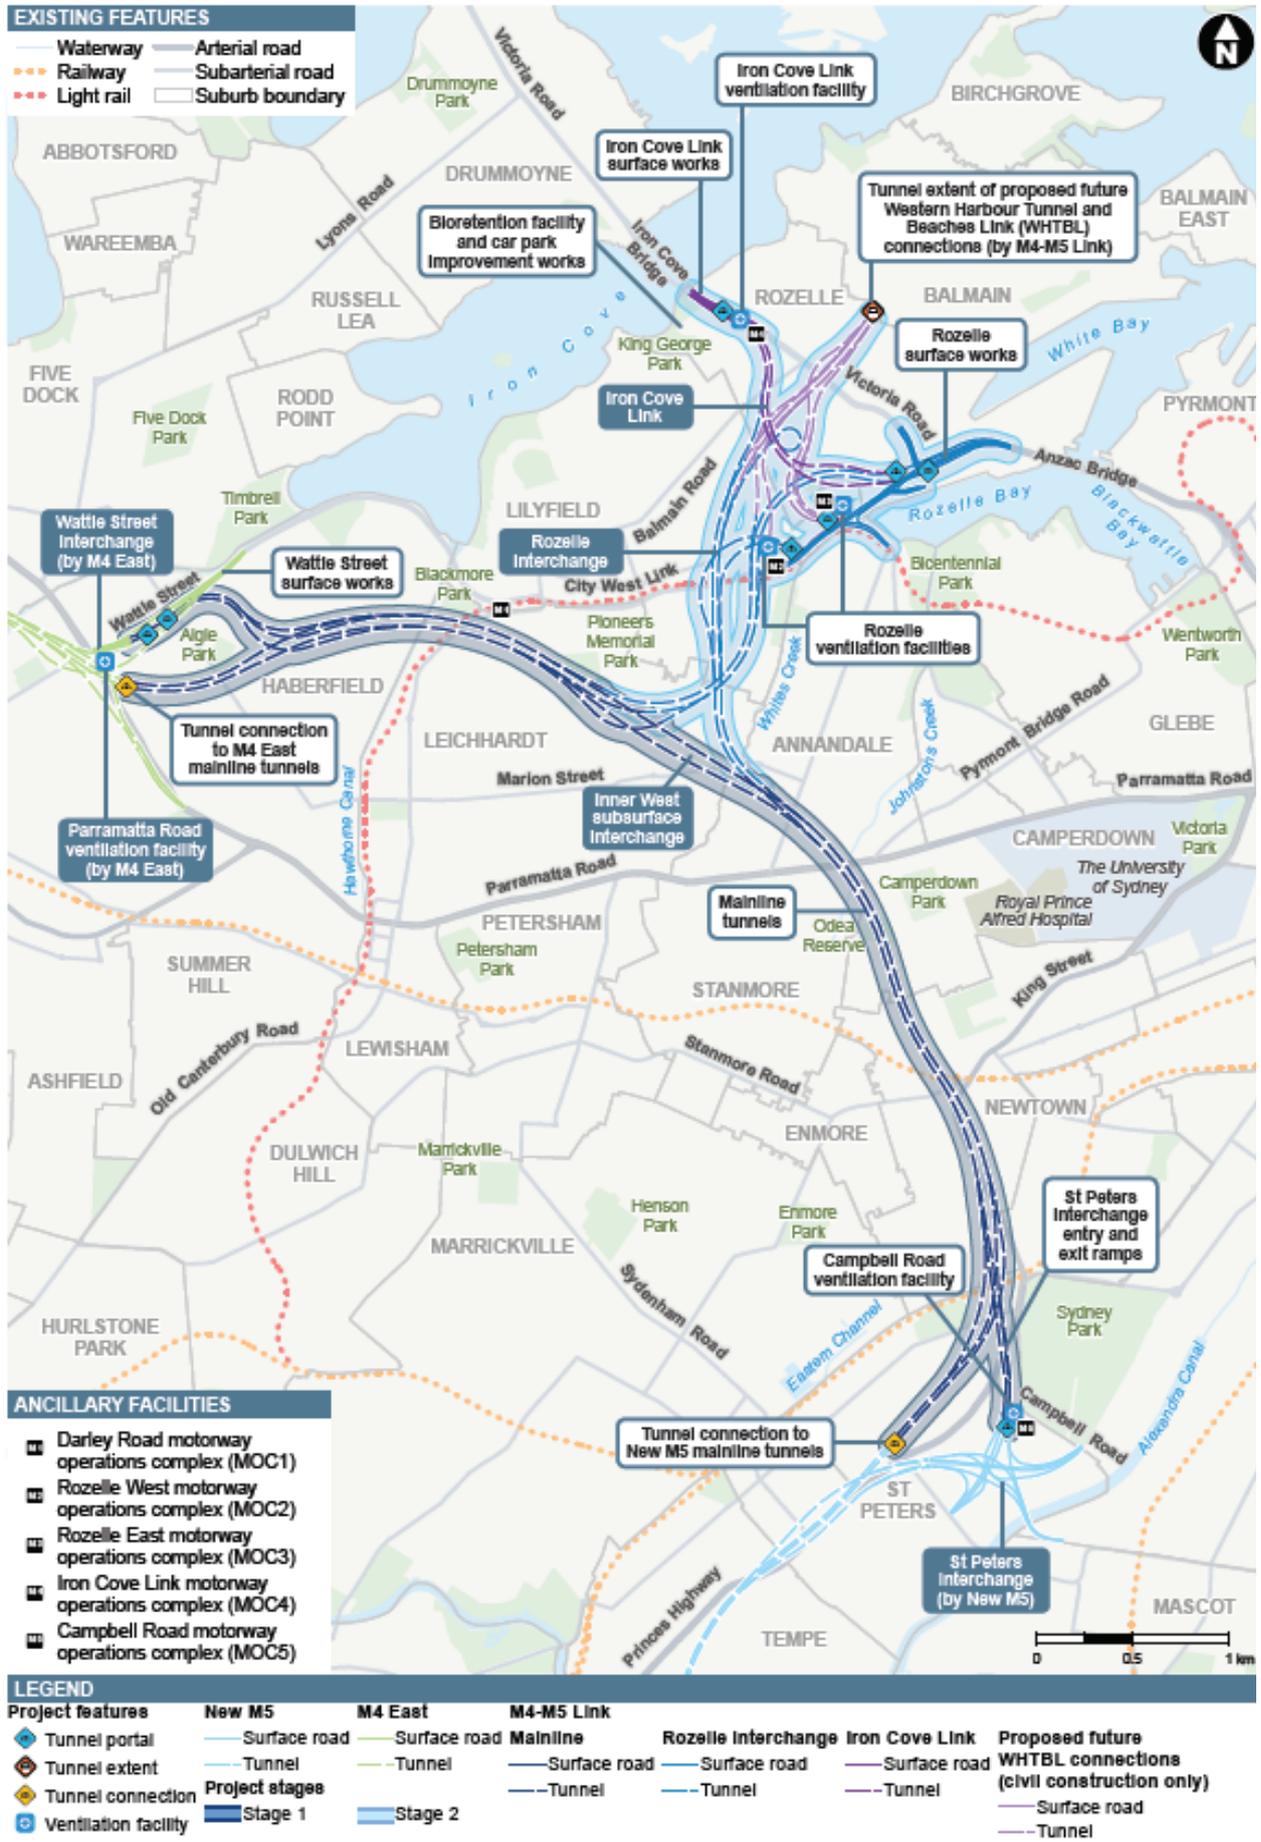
shows the Stage 1 and Stage 2 works proposed along with the proposed connections to adjoining projects and surface roads.
